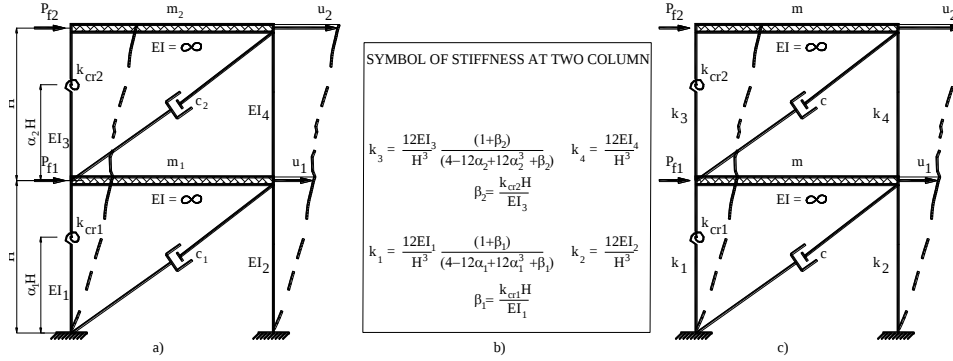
Model of two-storey building frame with cracks in the column
